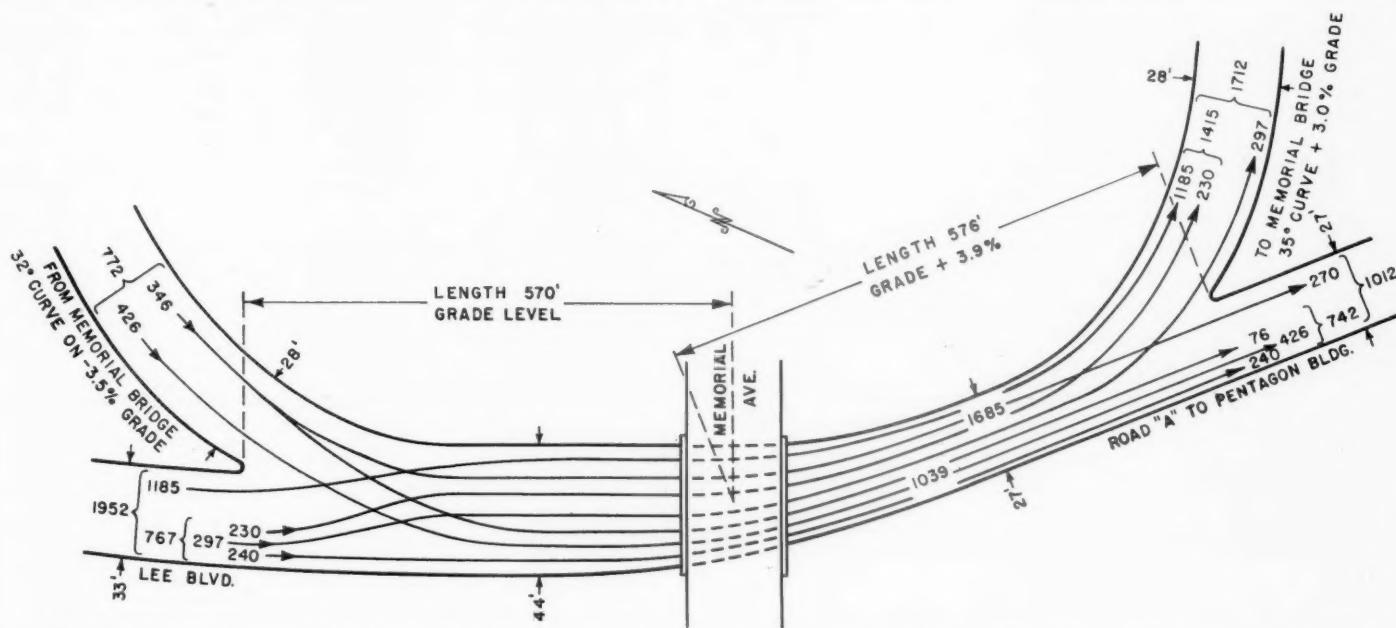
Maximum observed hourly traffic volume on mixing lane section on roadway under Memorial Avenue near west end of Memorial Bridge, Washington, D. C.
